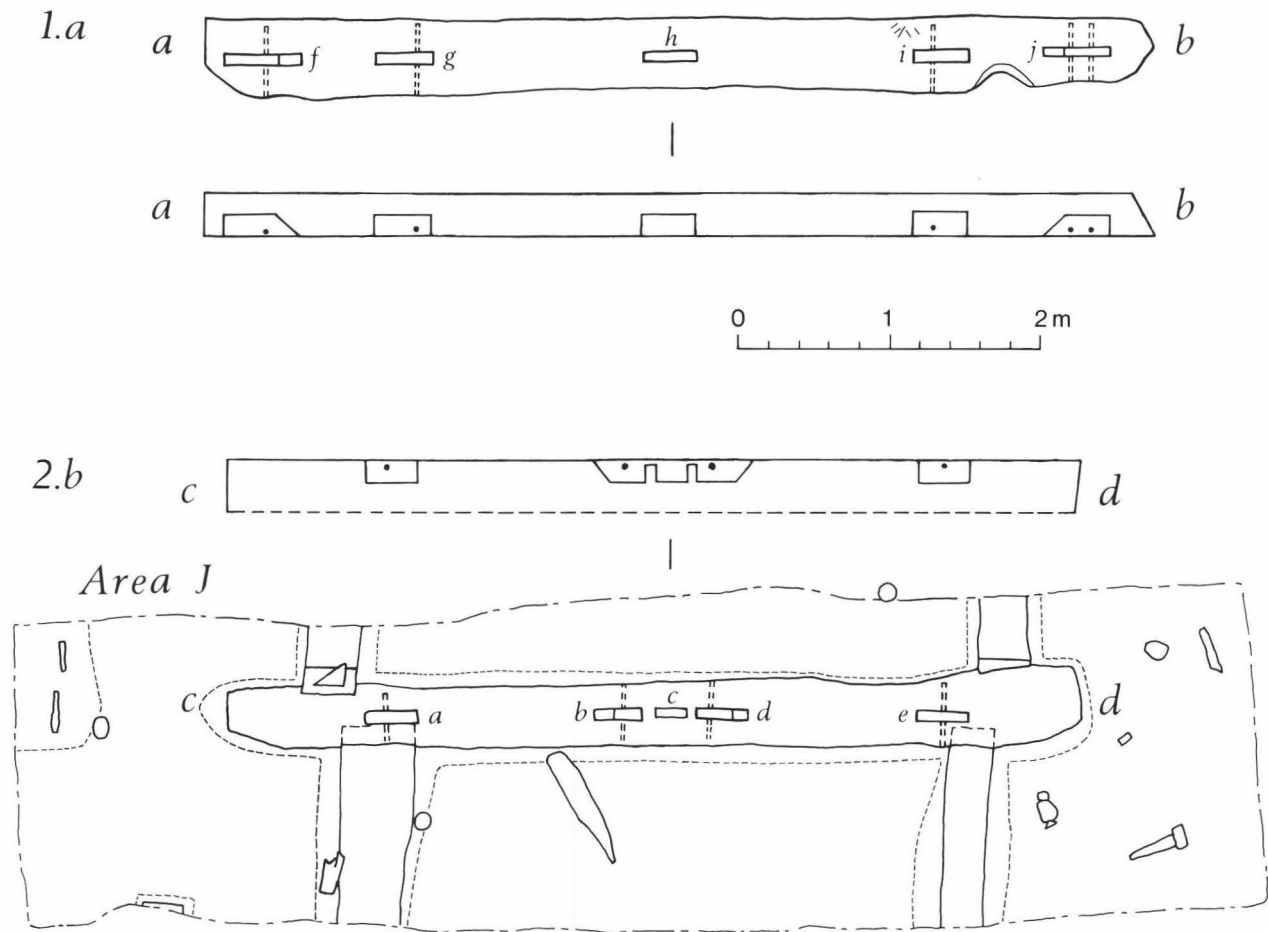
Laughton Place, 1984. Medieval timber bridge. a: Longitudinal upper plate. b: in situ bridge foundations.
